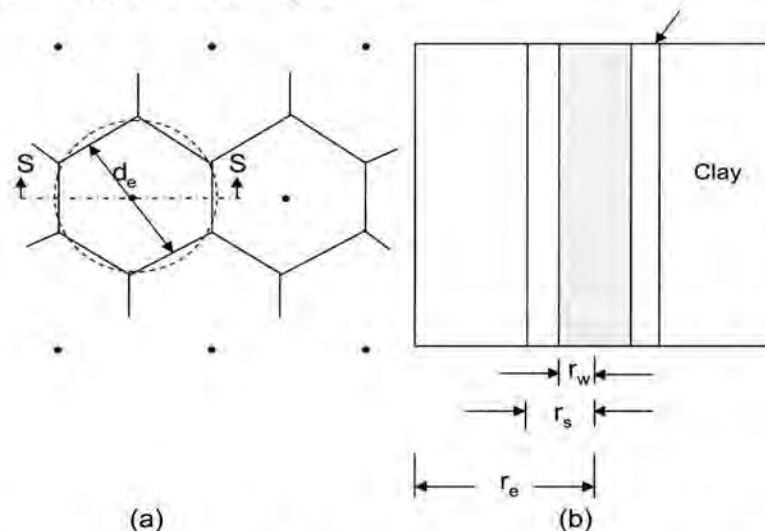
General layout of Sand Drains. (a) Plan. (b) Cross section at SS
